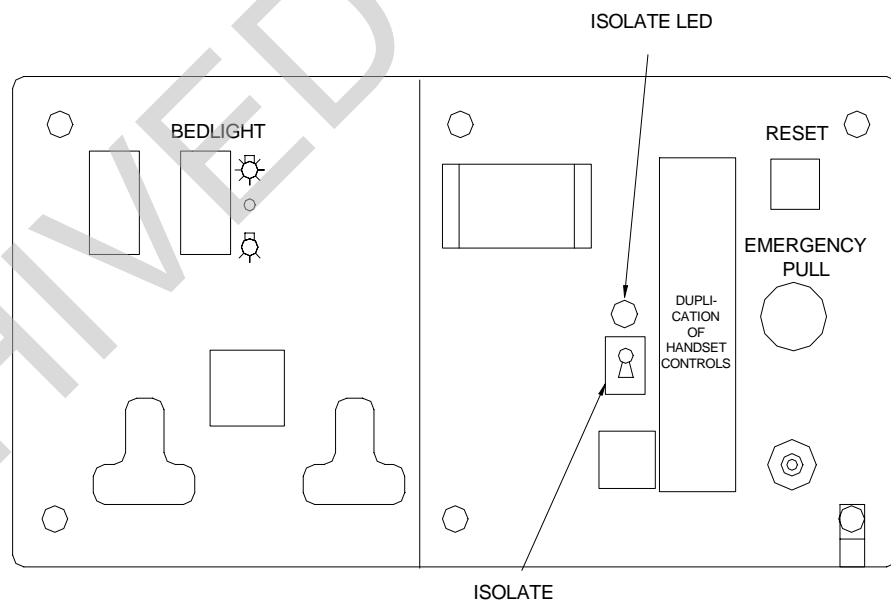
Typical layout of bedhead services panel with additional facilities of an isolation switch and dual control
